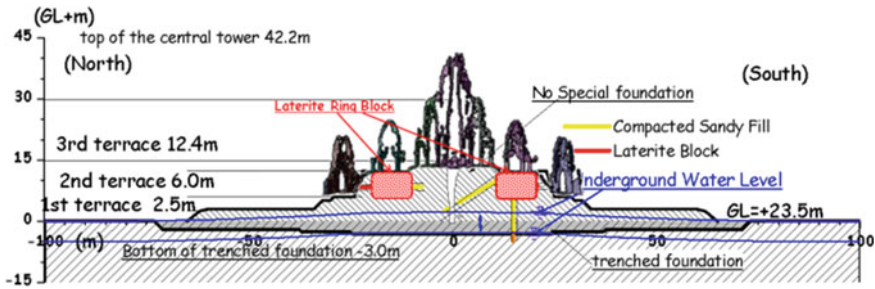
Trenched foundation structure and laterite ring block in foundation
